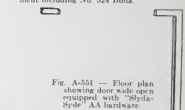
Floor plan showing door wide open equipped with "SlydaSyde" AA hardware.
